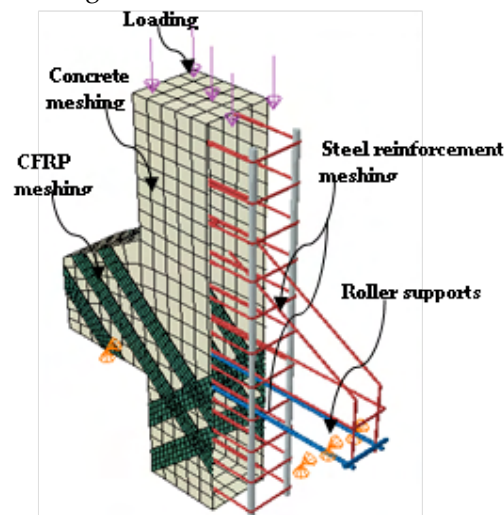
Meshing of concrete element, steel reinforcement, and CFRP strips
